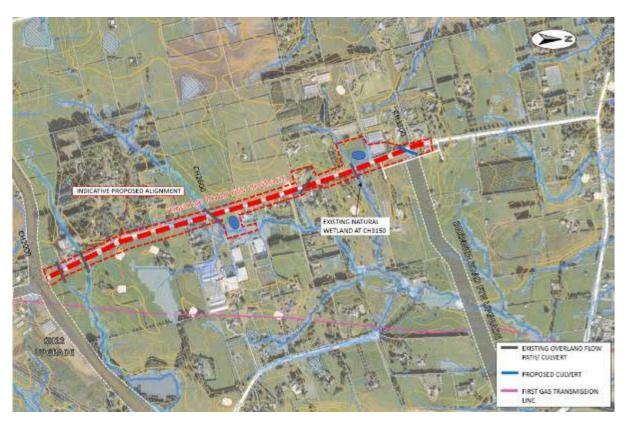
Construction zone – Jesmond Road FTN Upgrade
